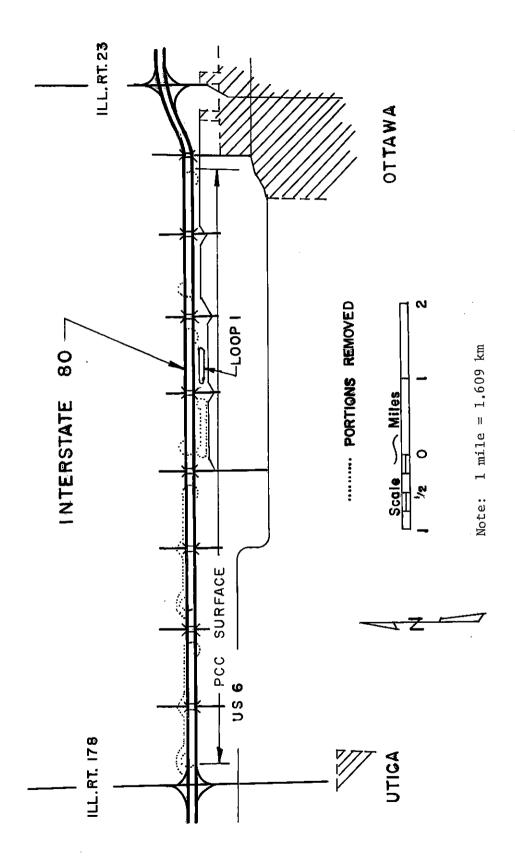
Layout of the Rehabilitated AASHO Test Road.
